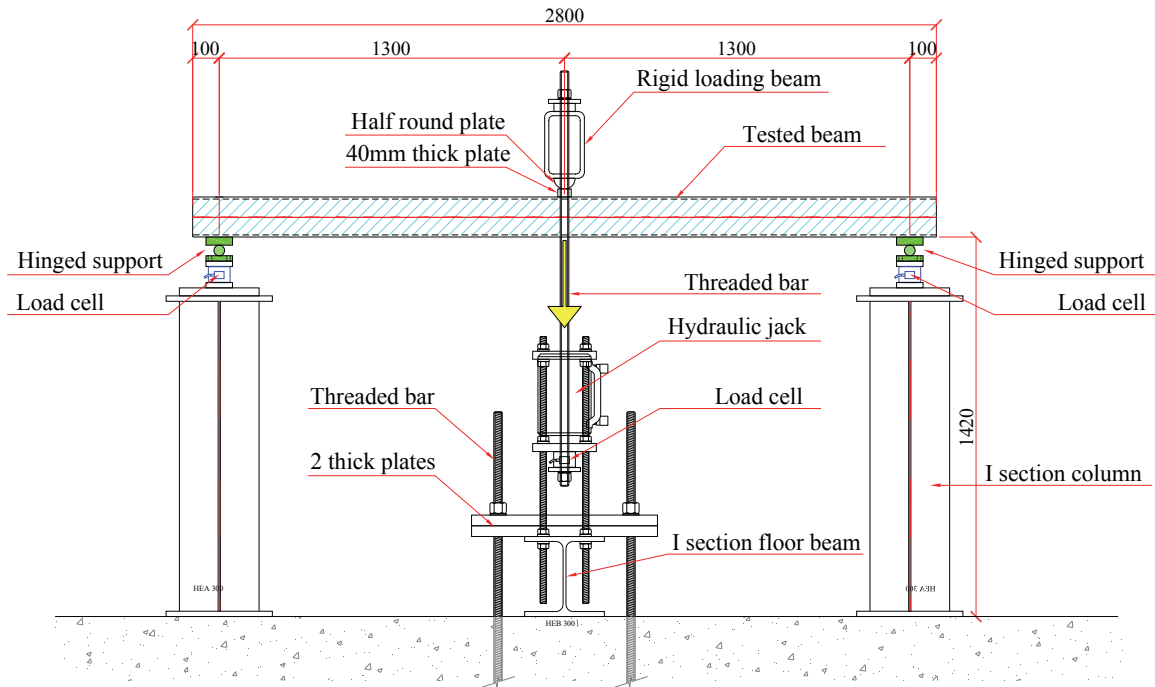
Test setup of the 3-point bending beam, longitudinal view (dimensions in *mm*)
